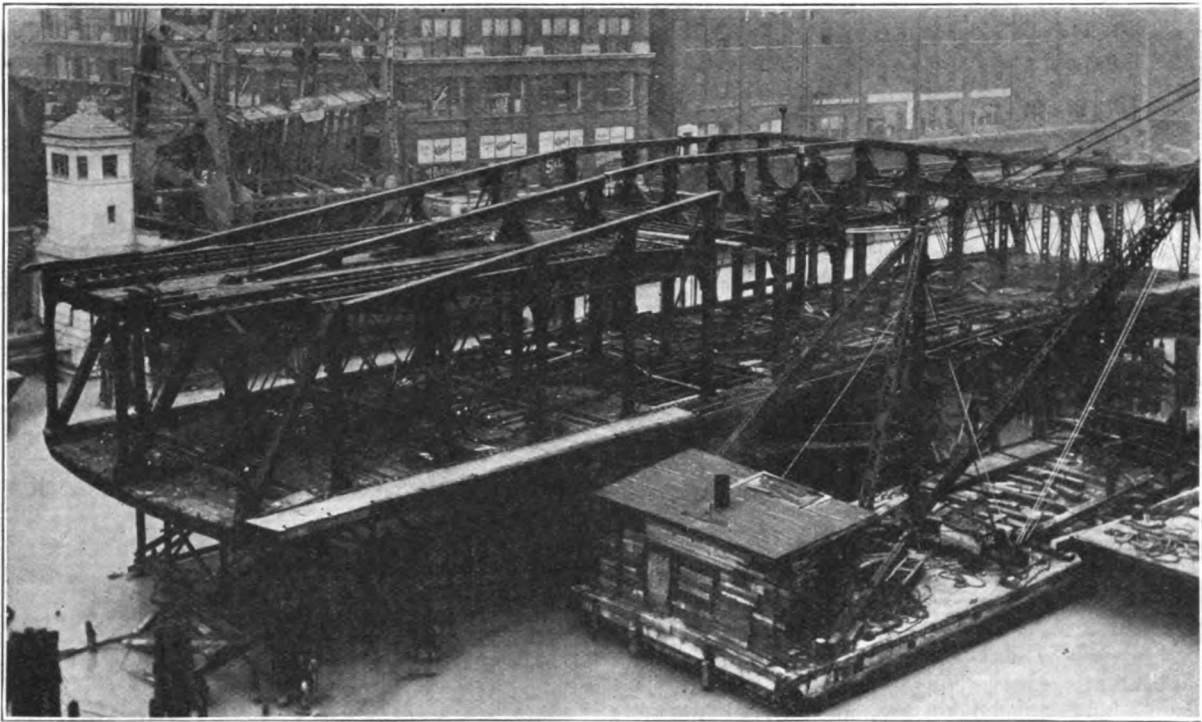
Cutting Away the Old Bridge. Derrick Mounted on Concrete Barge Removing Steel Members Cut from Bridge by Oxy-Acetyline Torches.
